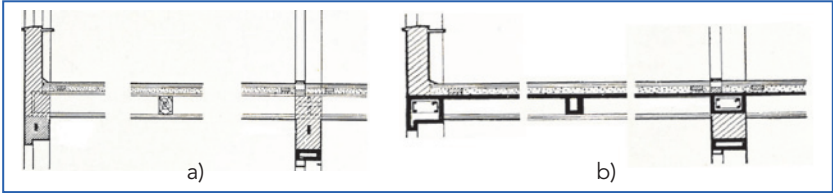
Connection of exterior brick masonry wall with a wooden ceiling (a) and reinforced concrete ceiling (b) [7].
